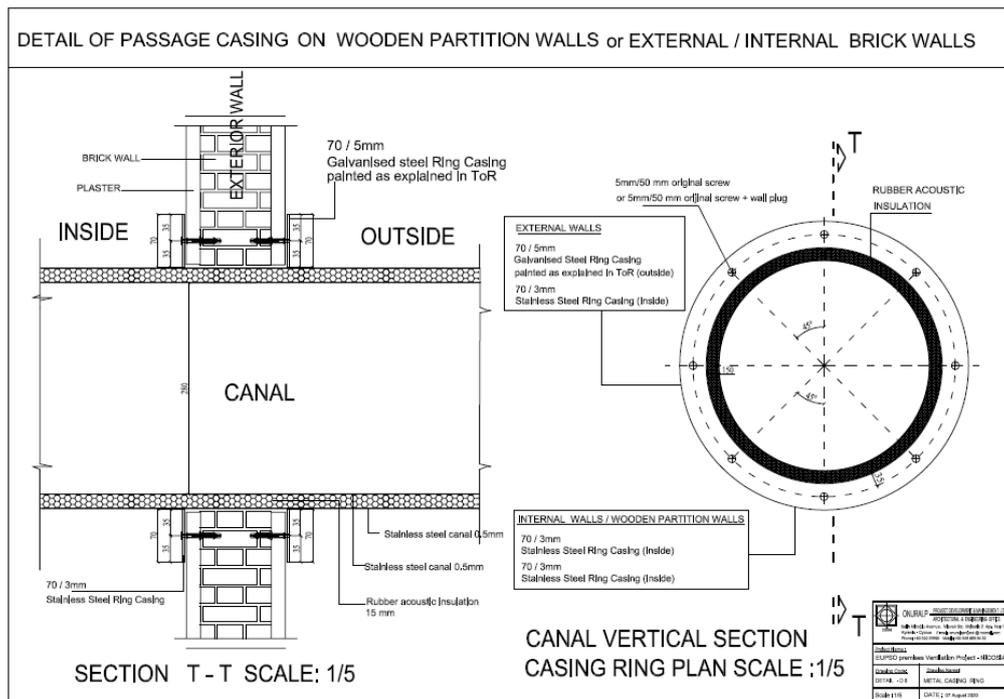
Horizontal Canal Passage through brick walls with casing – EUPSO project detail no:8
